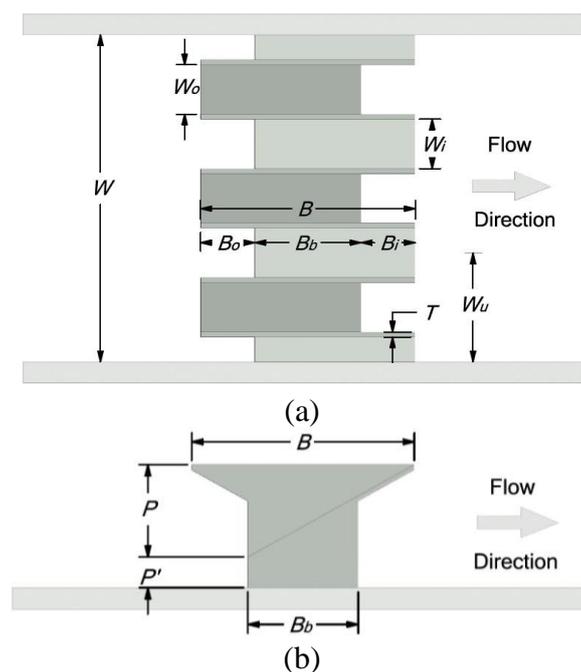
Typical geometry of PKW: (a) plan; (b) side-elevation.
